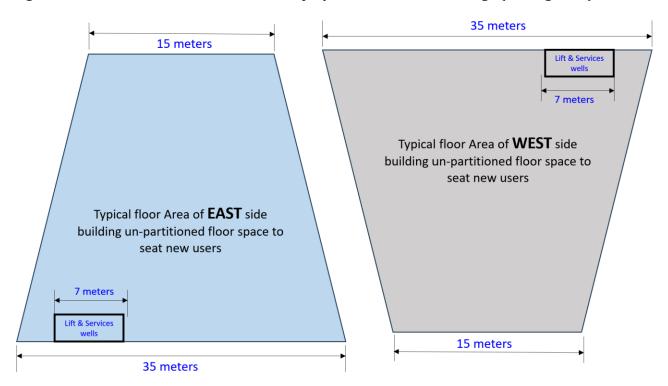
A Typical floor plan for structured cabling for LAN and WLAN
